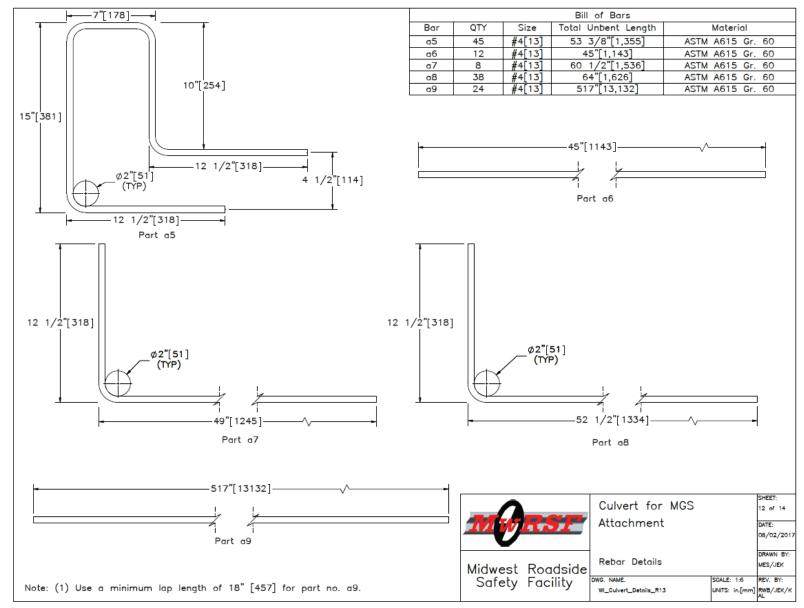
Rebar Details, Test Nos. CMGS-1 and CMGS-2
